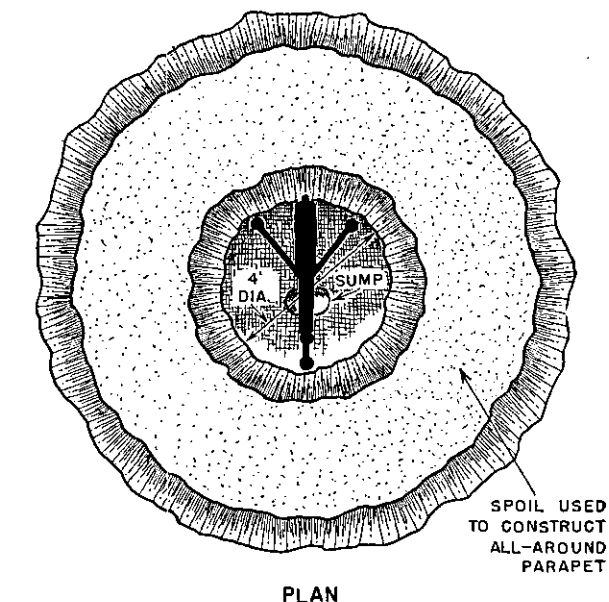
Antiaircraft emplacement for caliber .30 machine gun (heavy) with elevator. (Camouflage omitted.)
